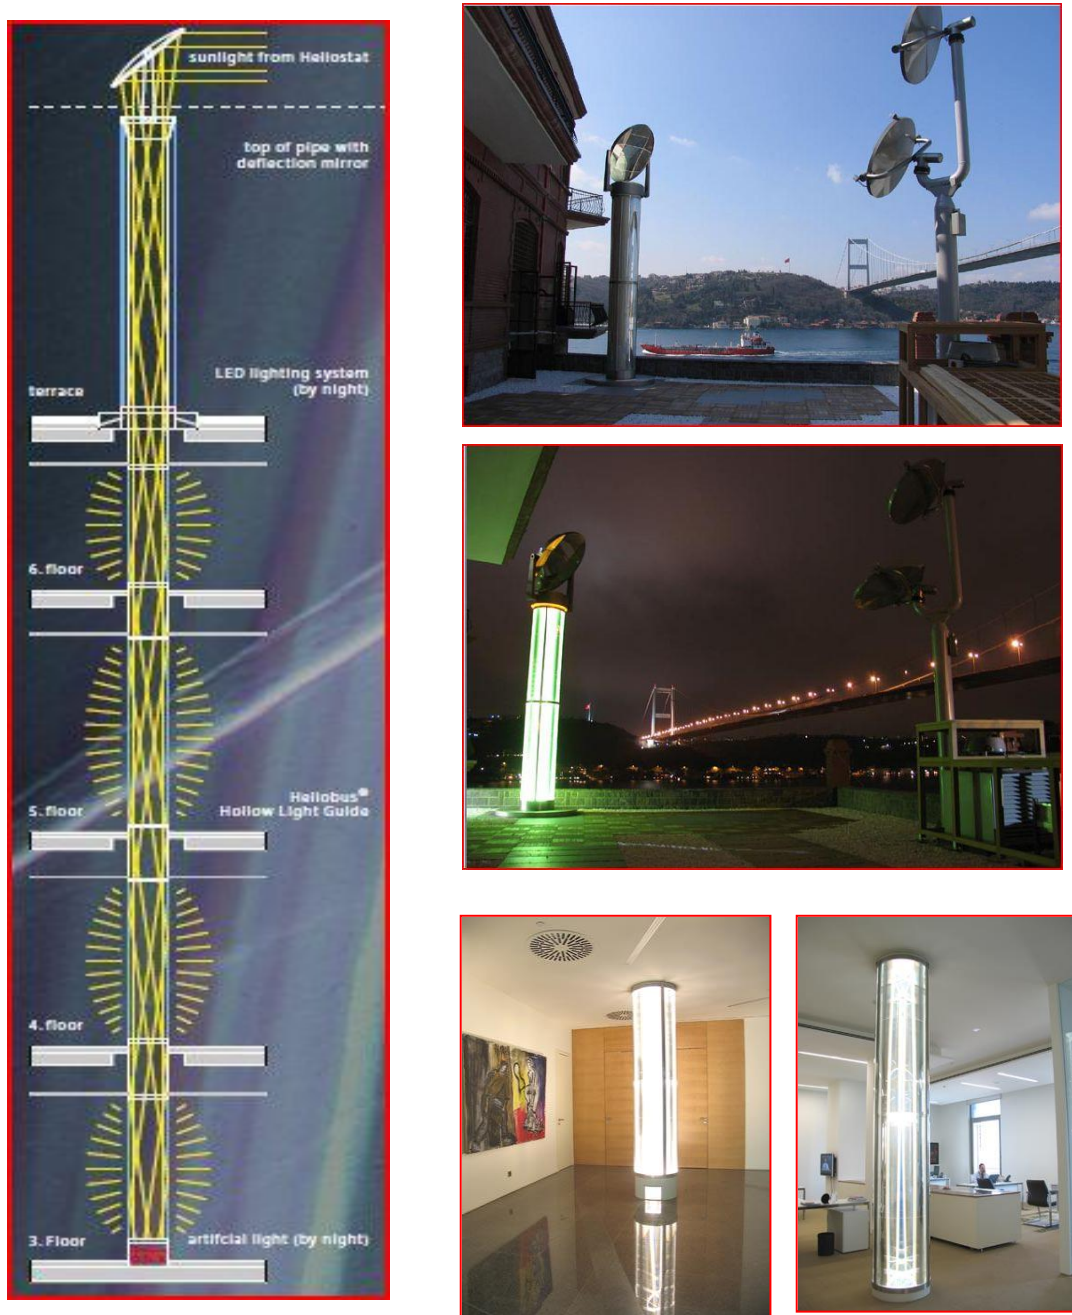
Light Pipe Serving Four Under Ground Floor of Borusan Group Building in Istanbul
